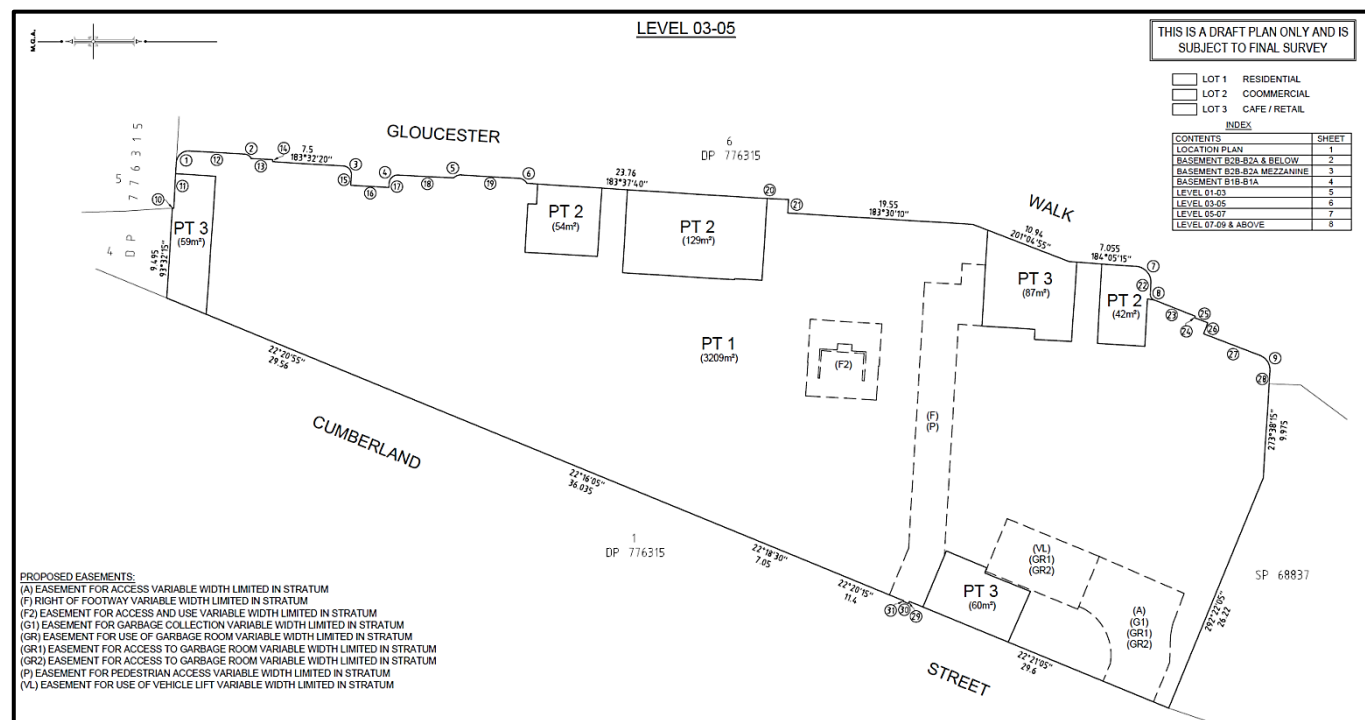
| Levels 3 – 5 (source: Applicant's proposed plans)
